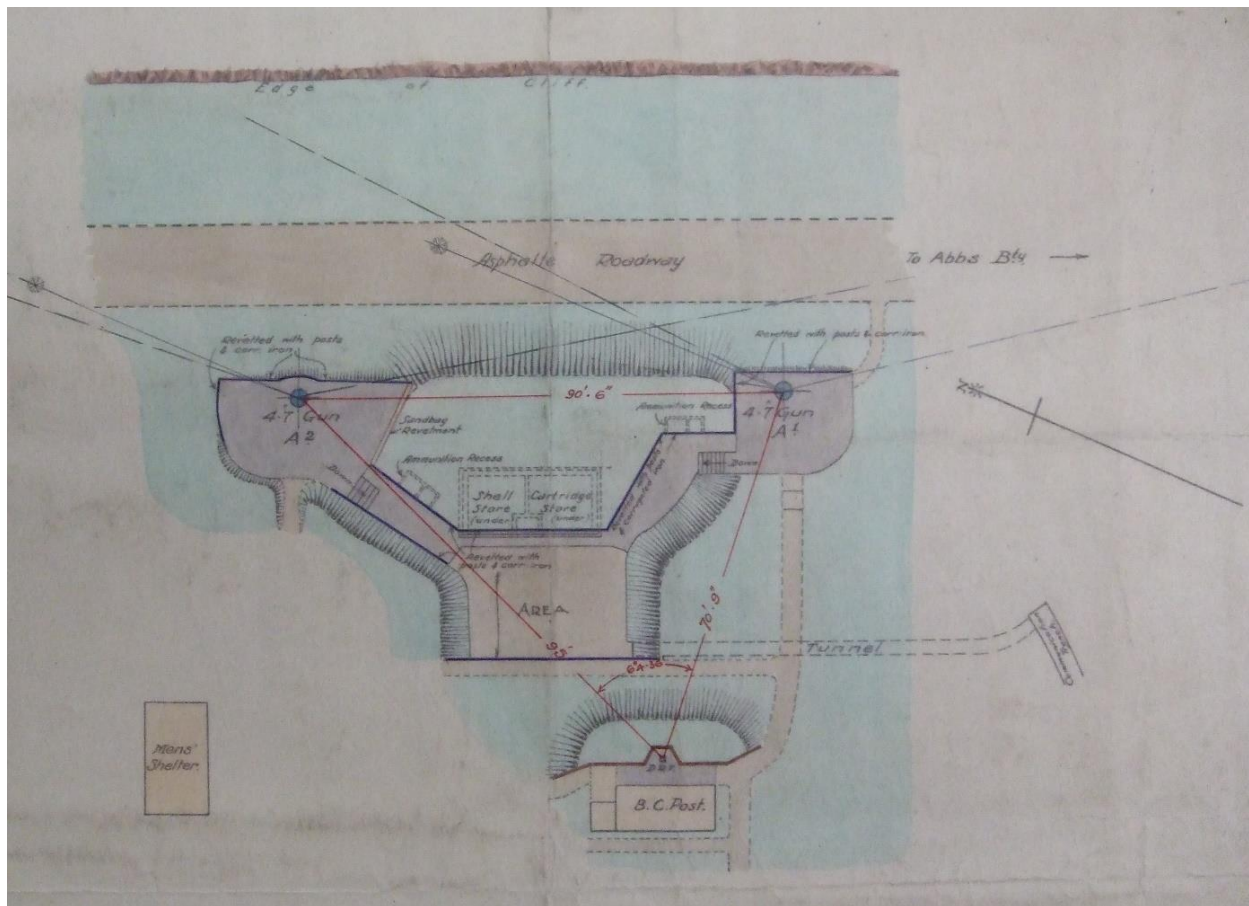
Plan of the First World War Examination Battery. The northern gun pit was the one found in the trench 1 excavation
